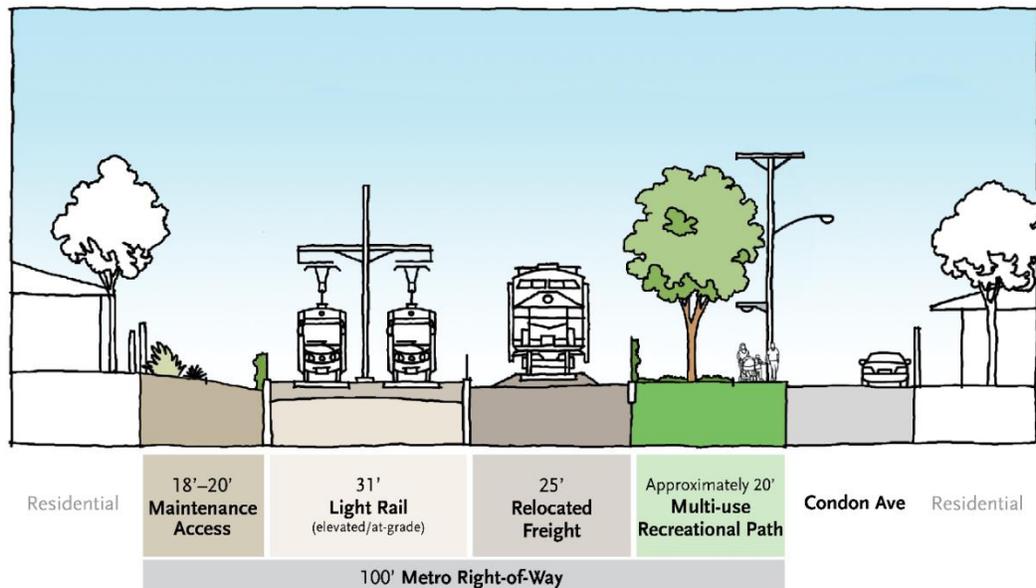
Proposed Project – Looking South Between Inglewood Avenue and Manhattan Beach Boulevard
